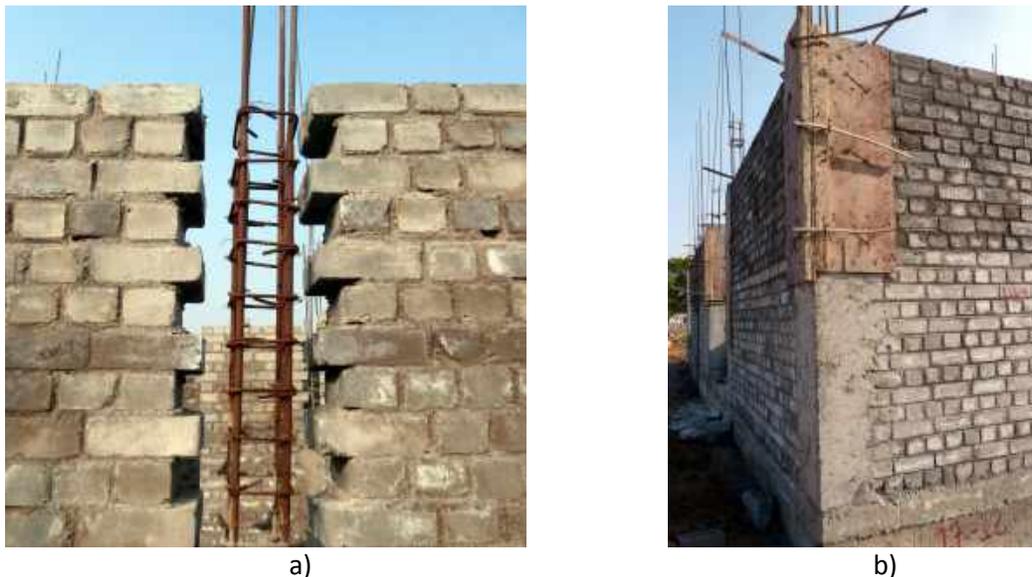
Construction details: a) toothing, and b) formwork for RC tie-columns.
